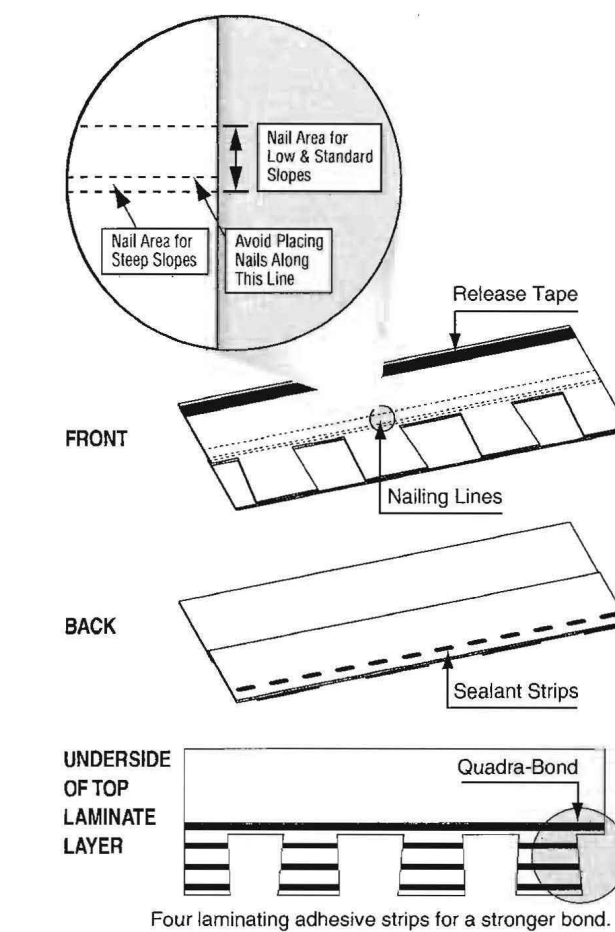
NailTrak features a wider nail area and extra-strong Quadra-Bond construction.
